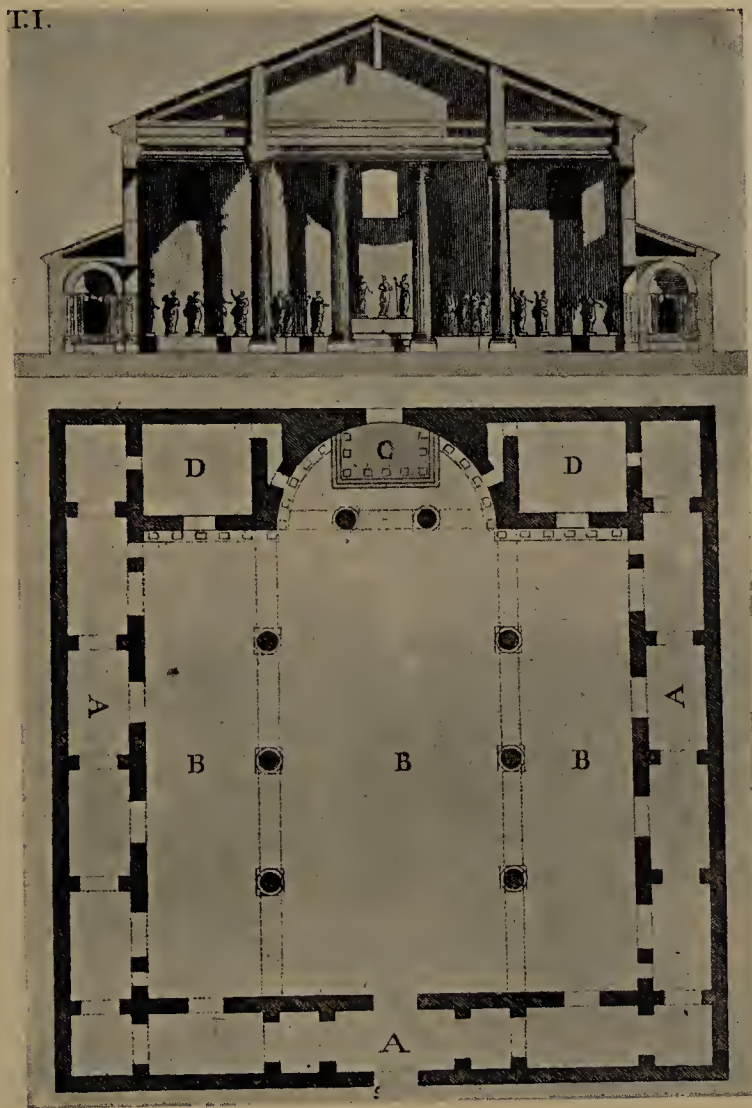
Otricoli. Plan and elevation of the Basilica
